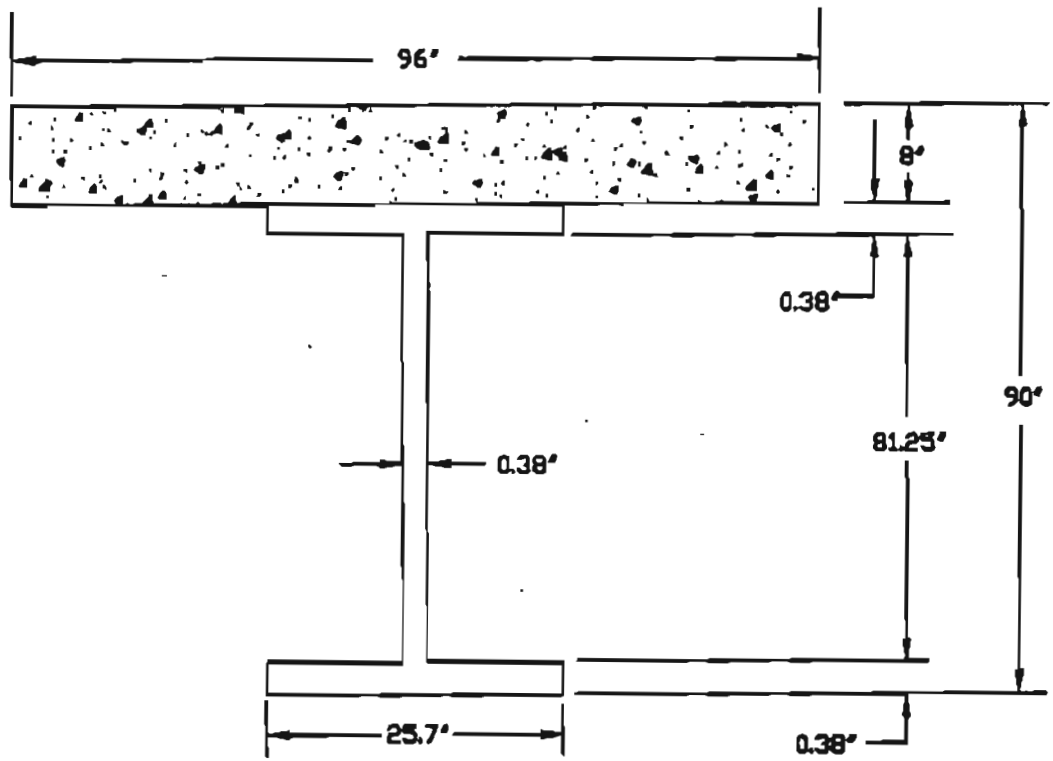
Cross Section of Example 150 ft Simple Span Bridge with 6 beams at 8ft.
